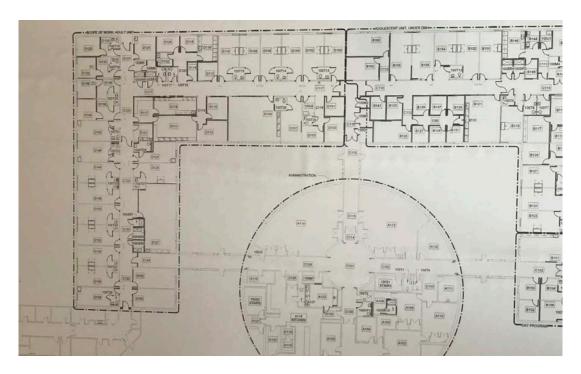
Floor Plan of McLean Hospital, East Campus
